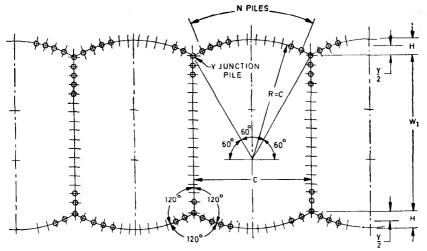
DETAILS OF LAYOUT OF DIAPHRAGM TYPE SHEET PILE CELL
